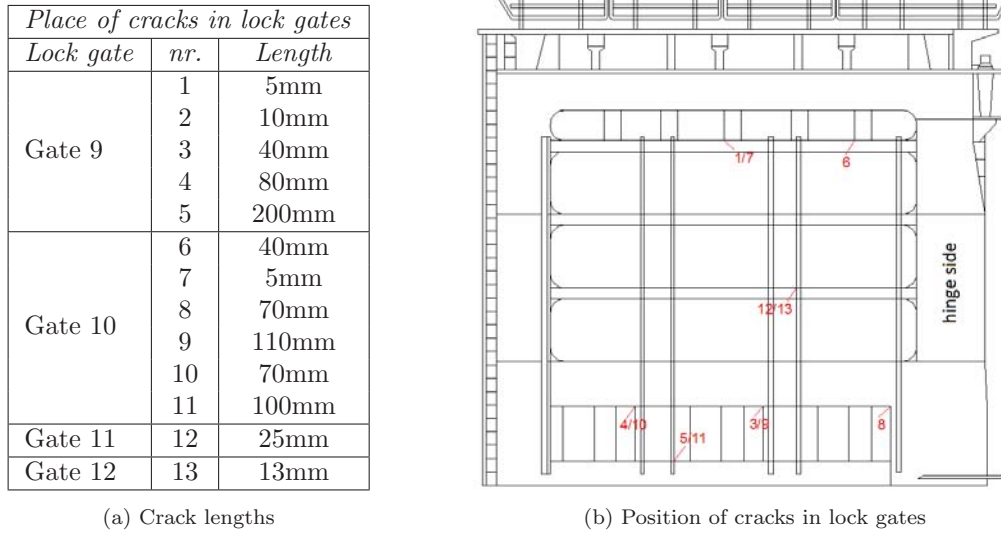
Terneuzen; Crack position in lock gates inspection 1999
